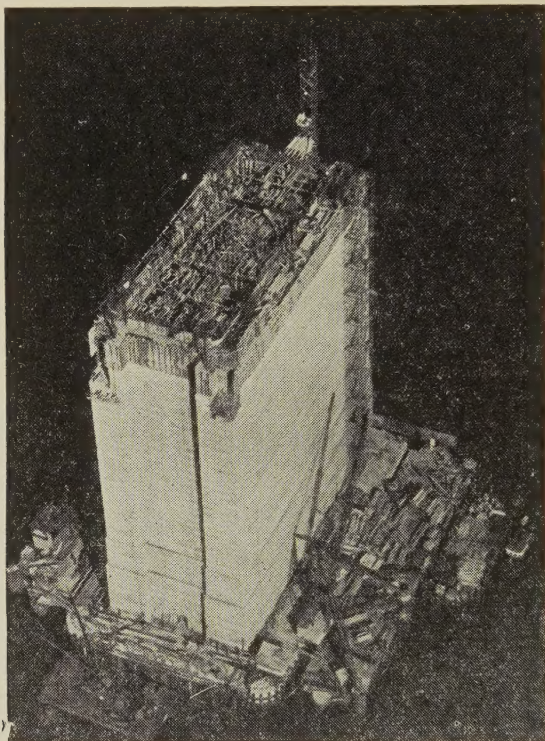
PIER W-4 PLACED AT ELEVATION OF 222 FEET
